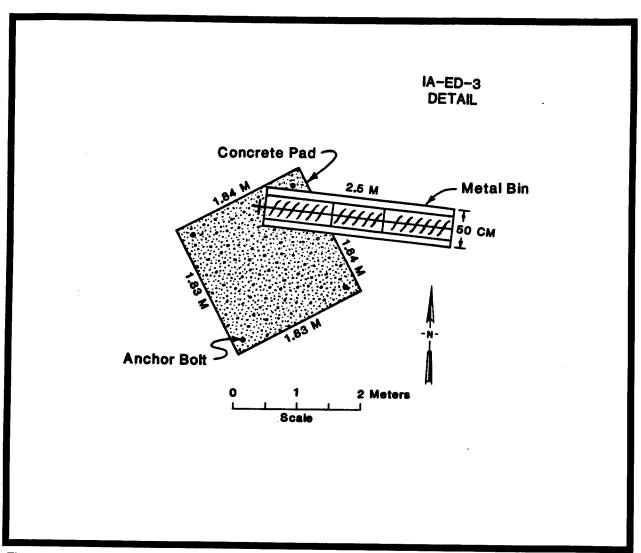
Detail plan of the concrete pad and metal bin at site IA-ED-3.
